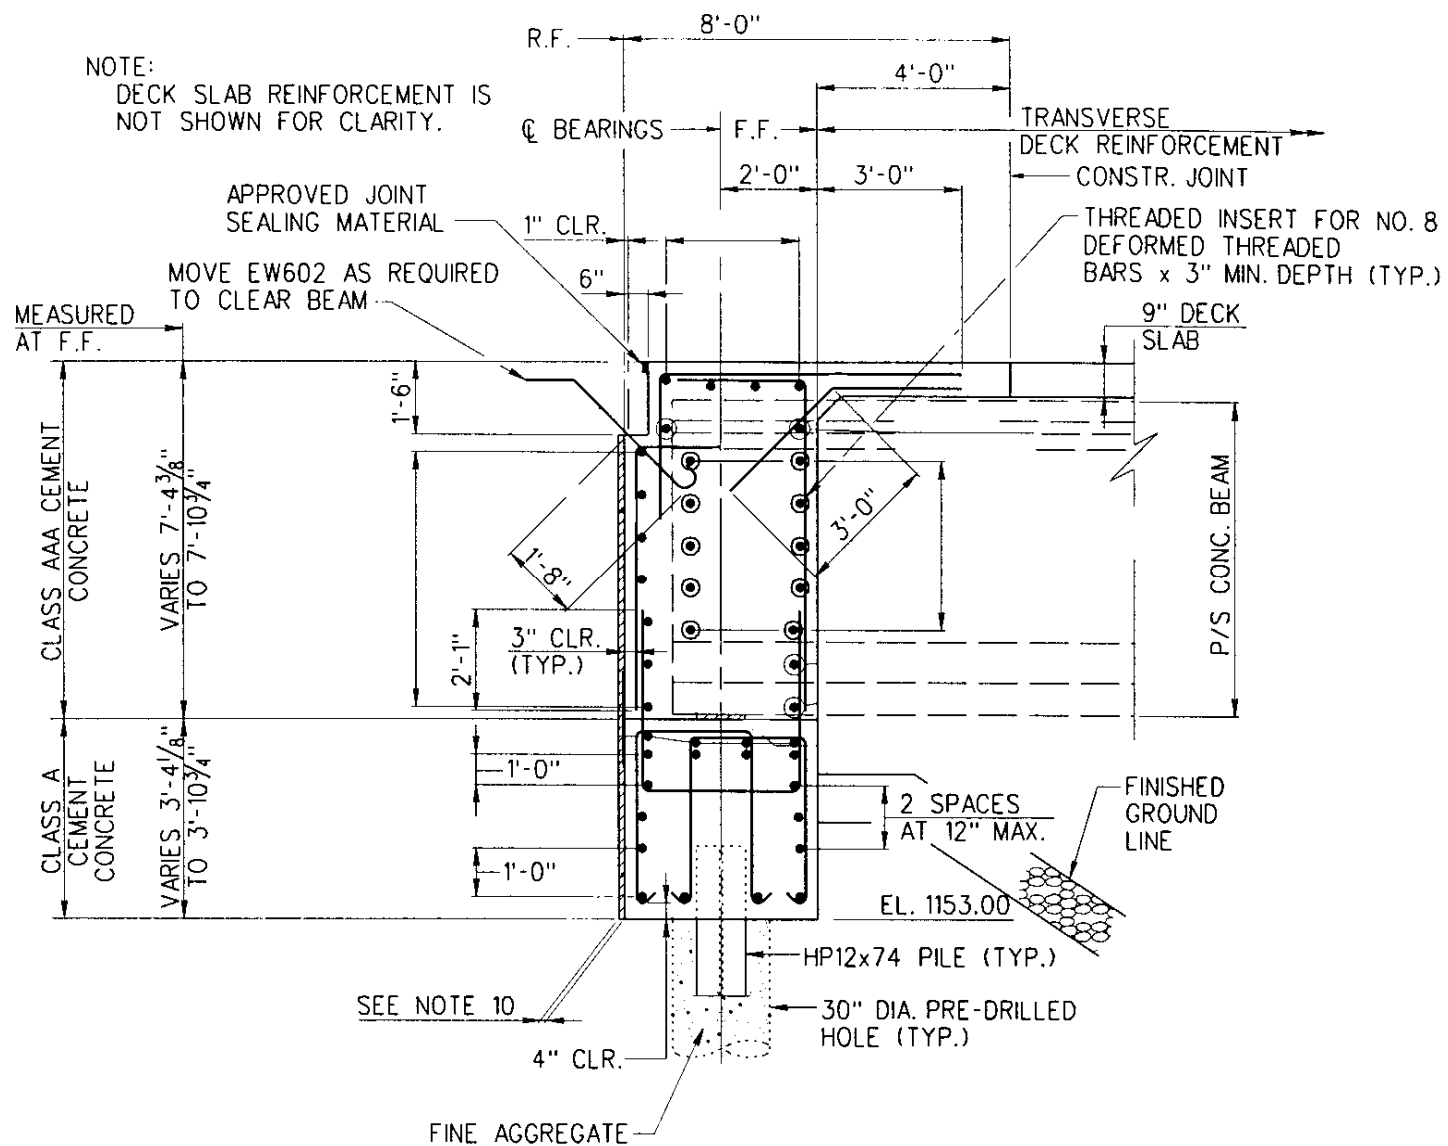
Cross-Section of Bridge 109 Abutment 1.
